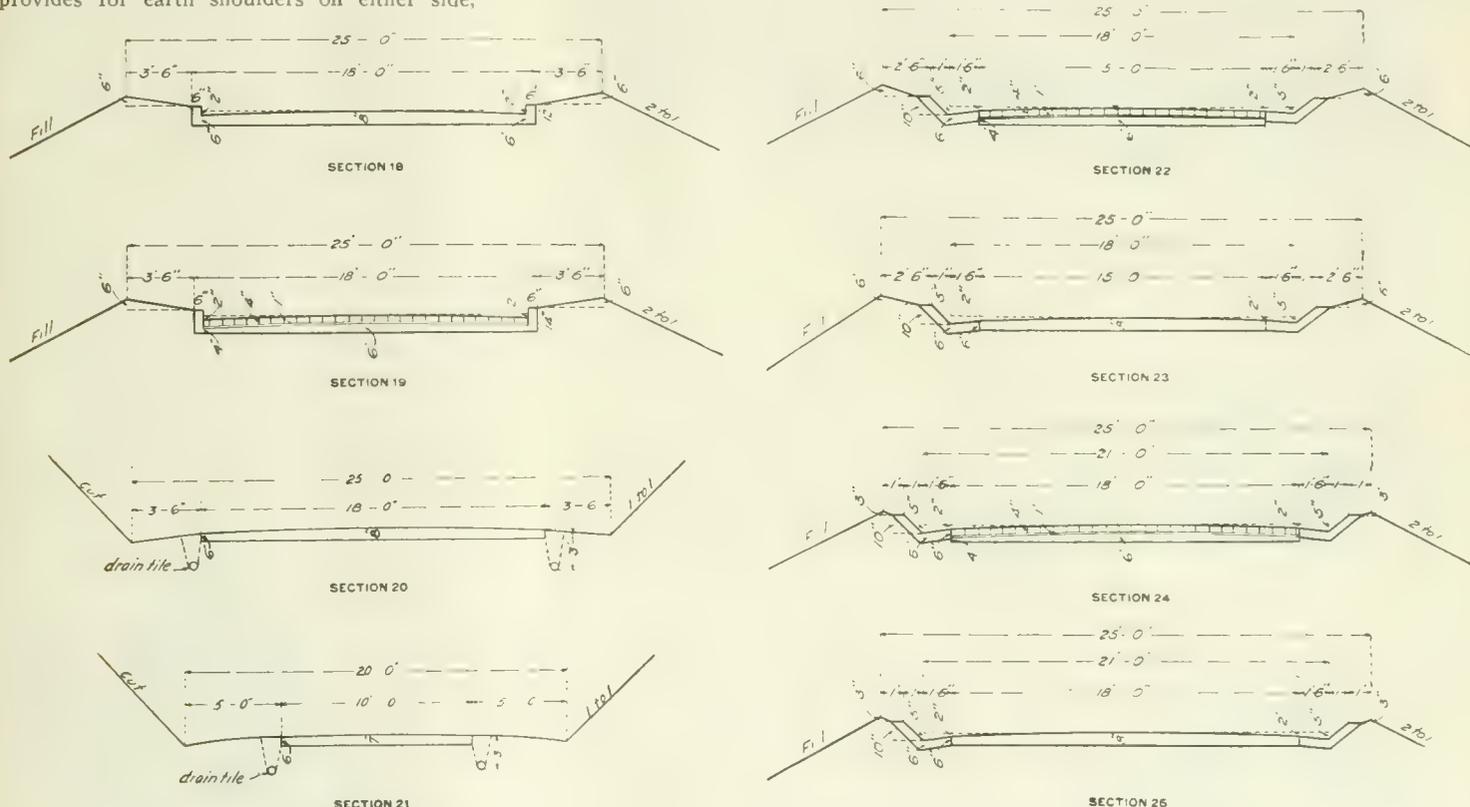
Standard Fill Sections With Curbs and Gutters and Cut Sections Without Gutters.
